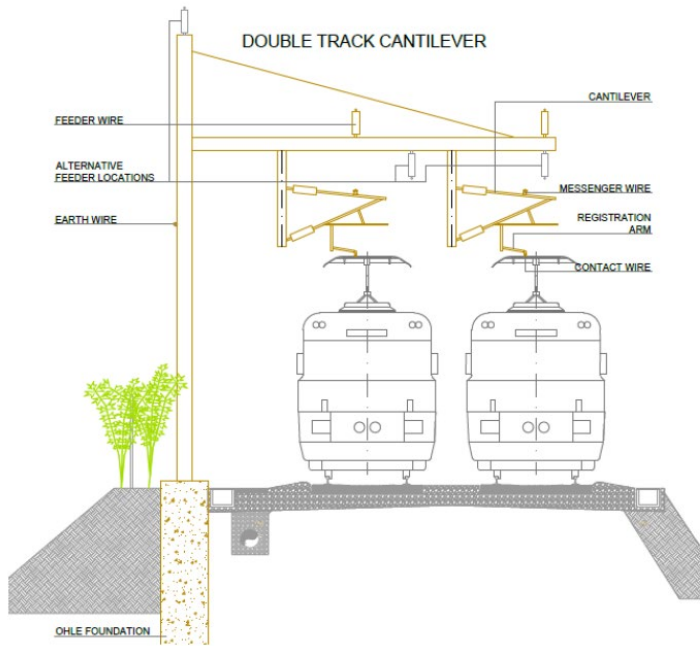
Twin Track Cantilevers (TTC) in 2-Track Section
